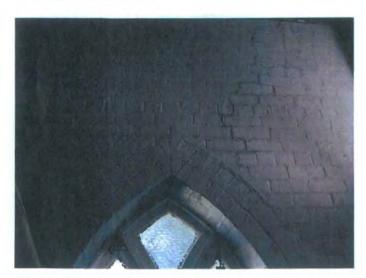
Internal cracking above arched window at outer skin bulge location on East wall
